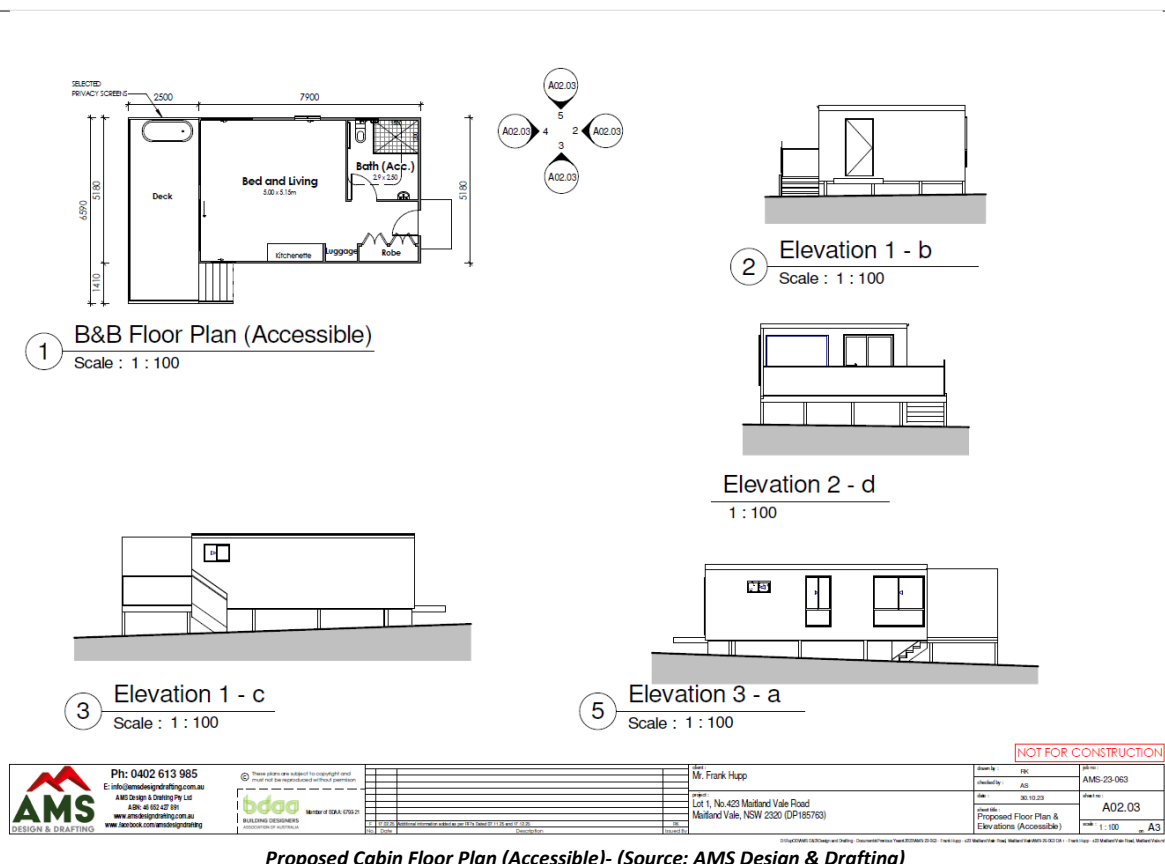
Proposed Floor Plans (Source: AMS Design & Drafting)
